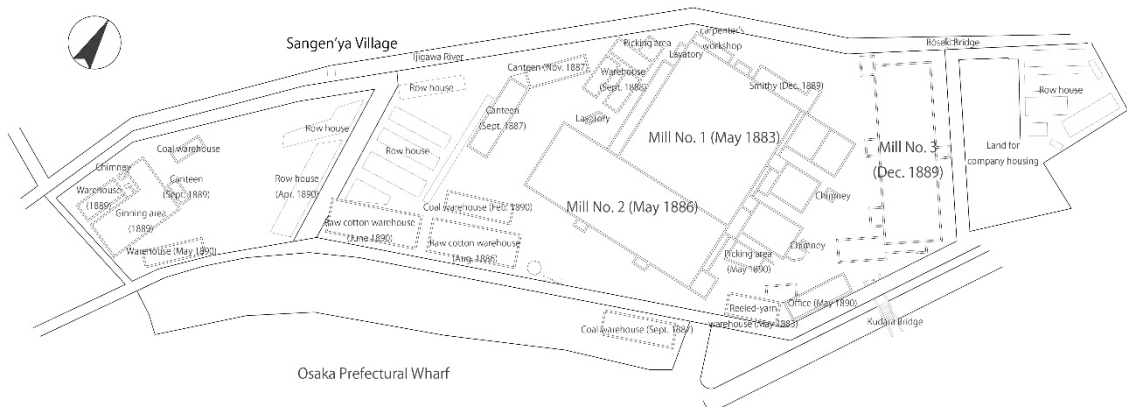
Site plan, Osaka Bōseki (as of June 1890)
